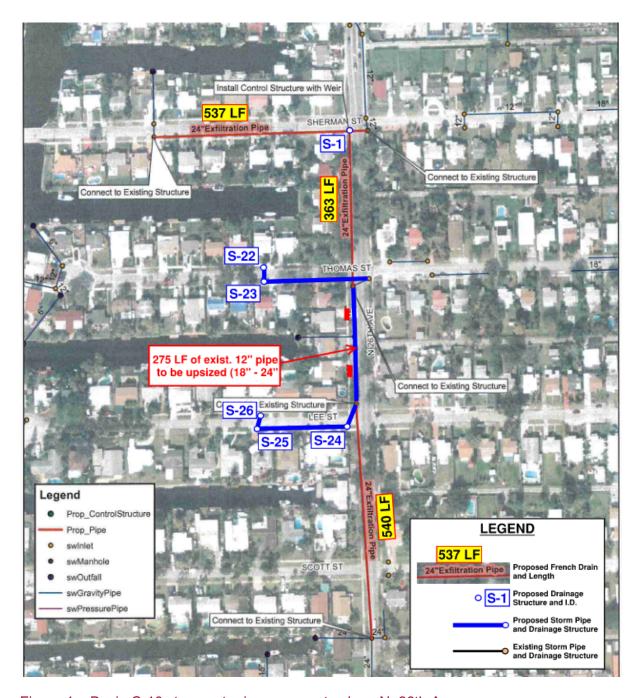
Basin C-10 stormwater improvements along N. 26th Avenue.
